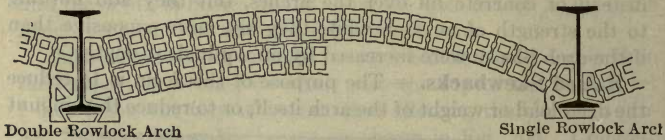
"Haverstraw" Hollow Brick Segmental Arches.
